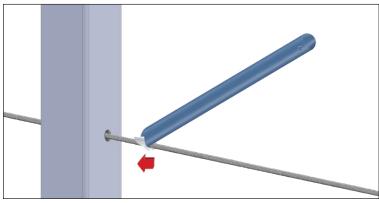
Figure AO. With the grommet install tool, push the cable grommet into the cable hole in the post until it fits flush.
